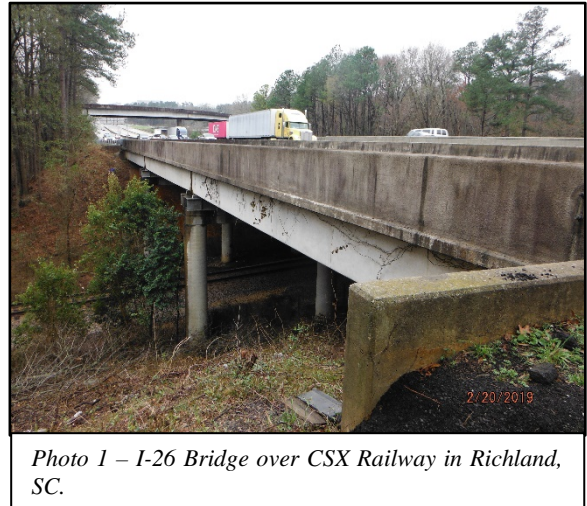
I-26 Bridge over CSX Railway in Richland, SC.
